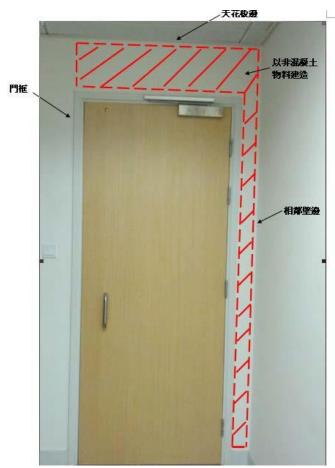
The small areas between door frame and ceiling, and between door frame and adjacent wall constructed by non-concrete elements
